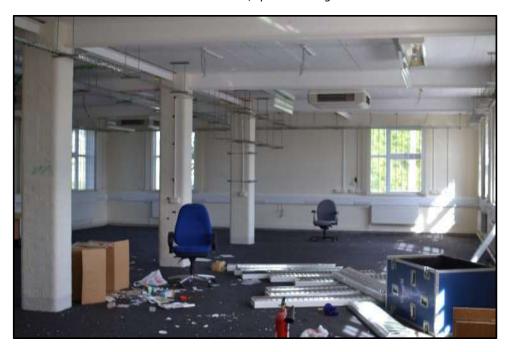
D Block, spur 6. Open plan arrangement with structural brick columns of the original construction method to centre of the room
